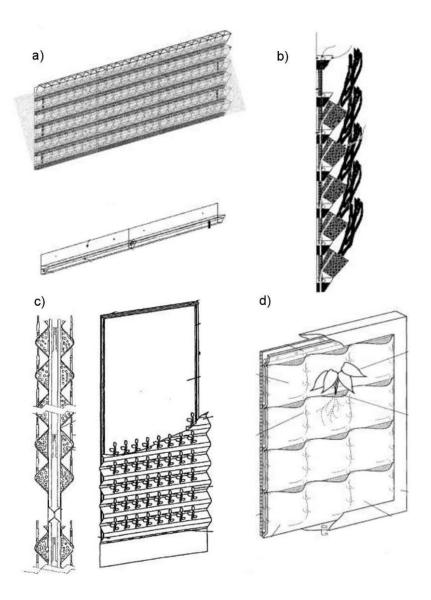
Patents: a) Vertical Plant Wall [9]; b) Vertical Plant Wall [10];
